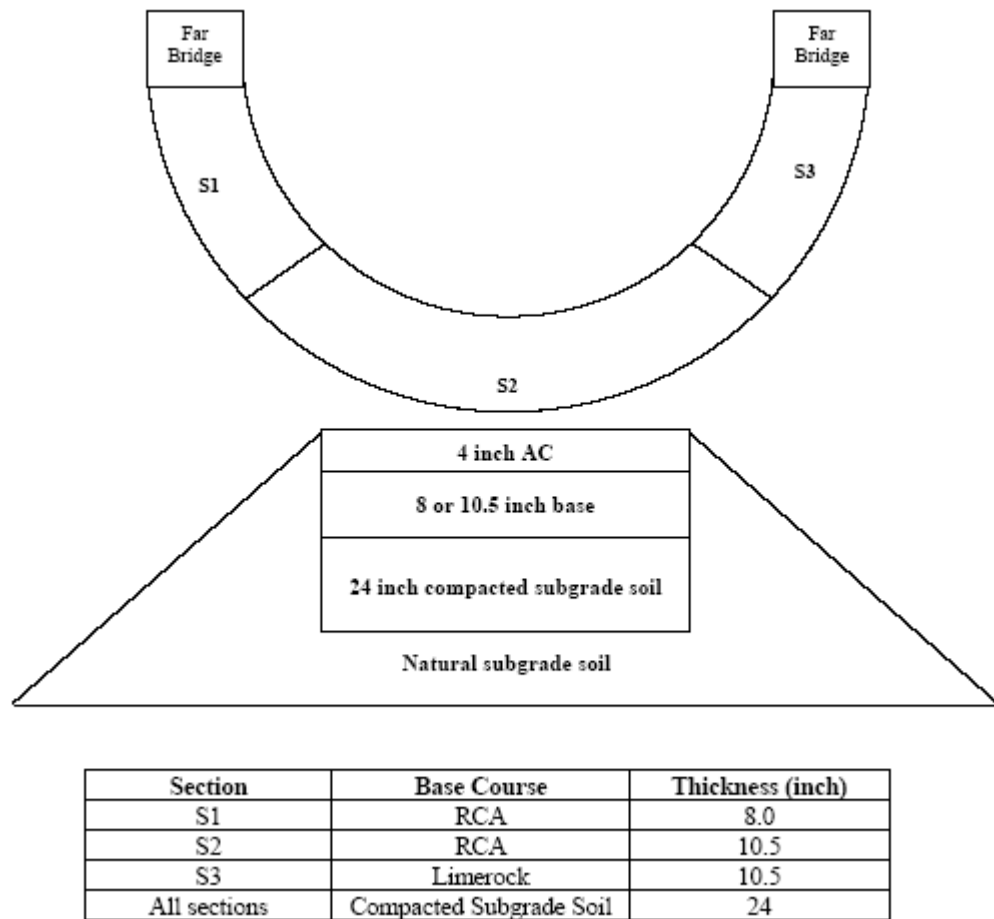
Test section layout and cross-section details at the UCF-CATT.
